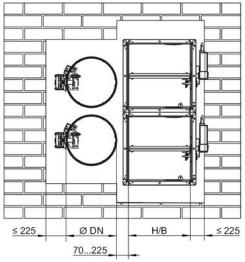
Mortar-based installation into a solid wall made of gypsum wall boards
